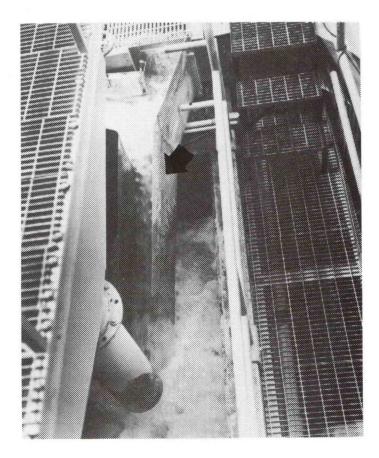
Bypass flume exiting into downwell to tailrace at McNary Dam.
